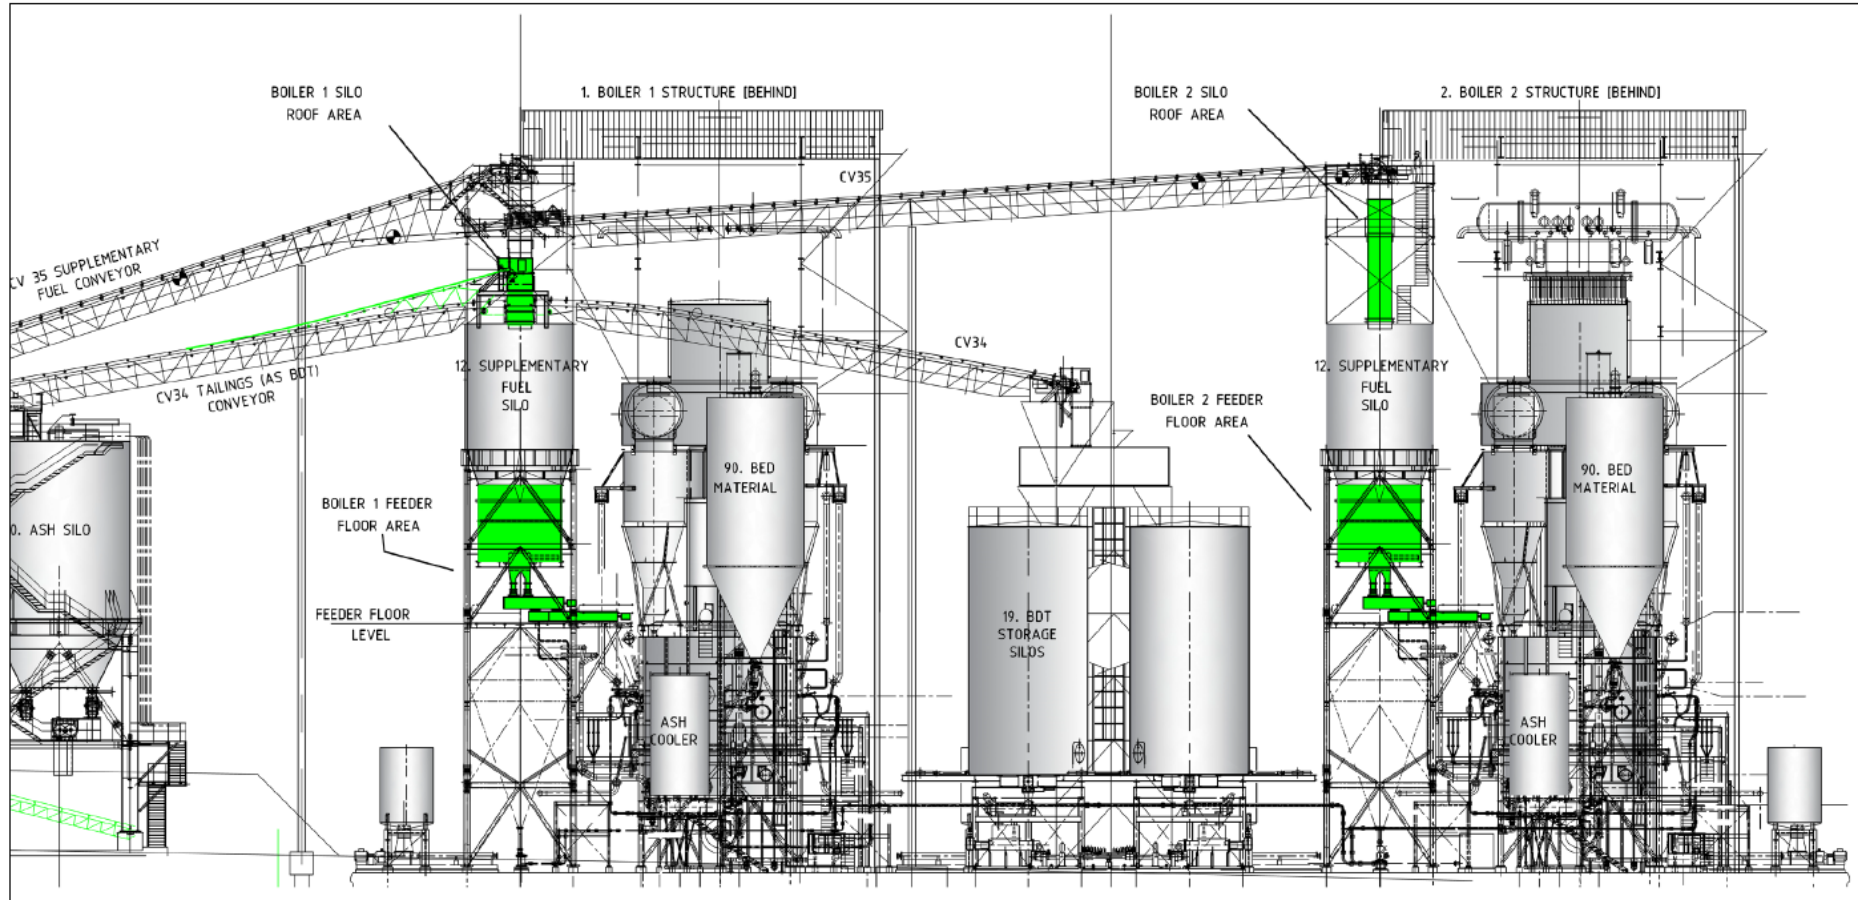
Boiler plant area proposed plant/equipment changes in green. East elevation view. Refer to Appendix 3 for high resolution plan.
